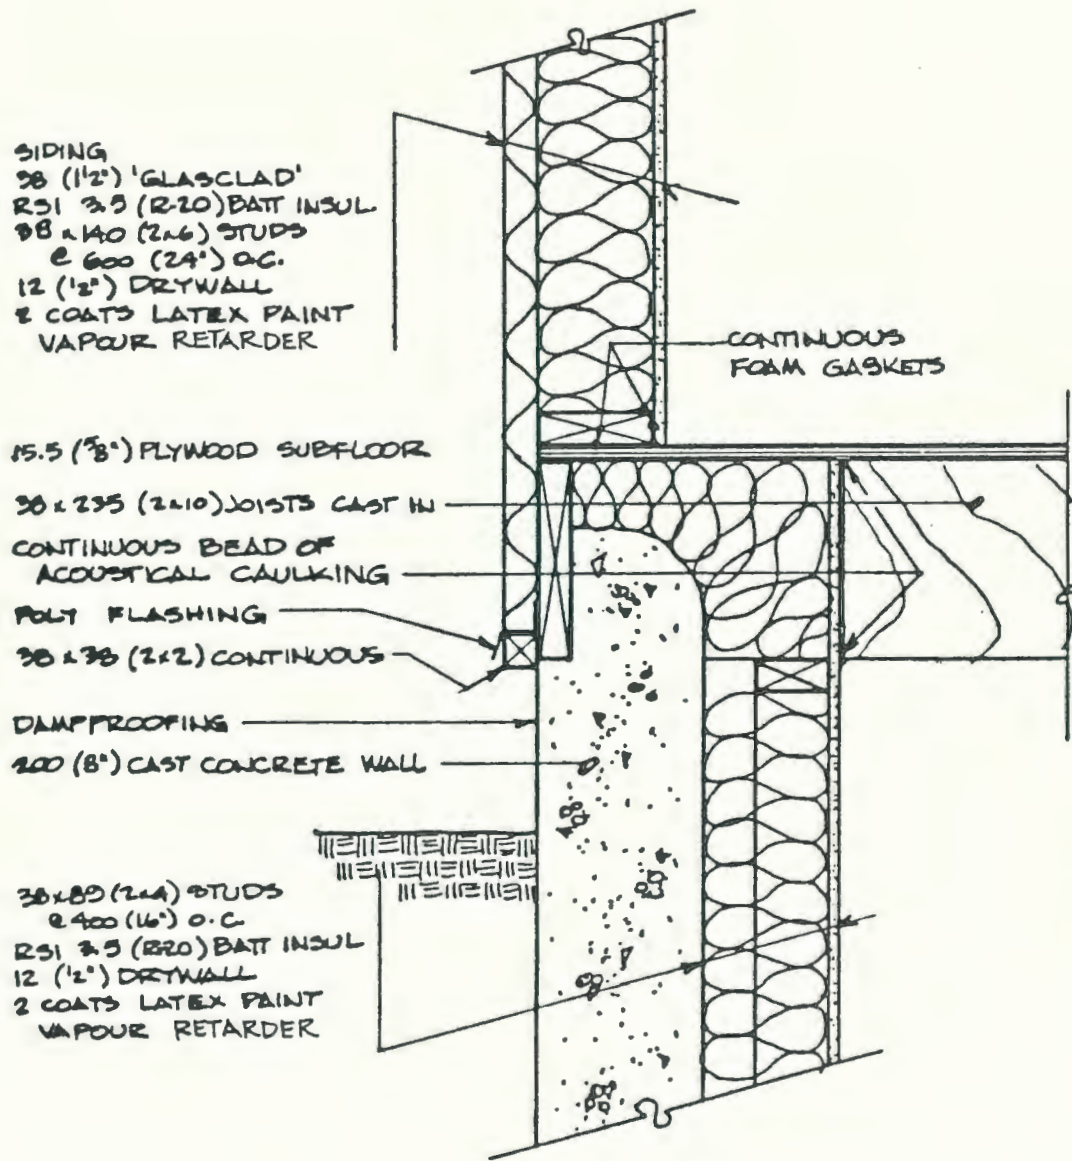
Top of Concrete Foundation Wall - Alberta Demonstration House
